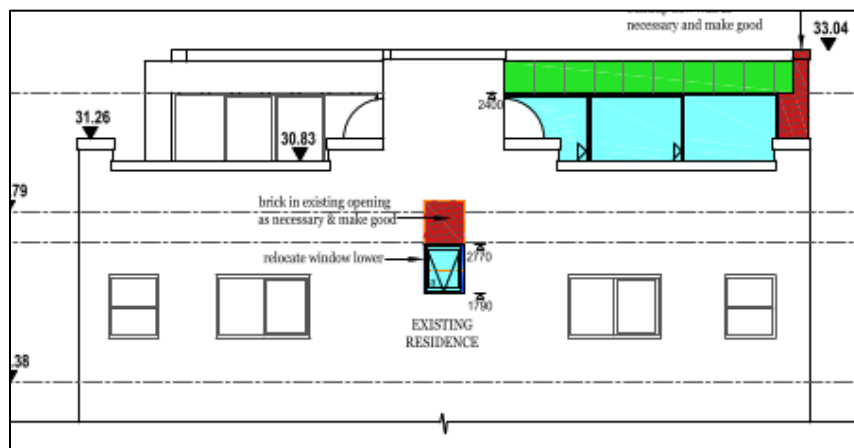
Southern elevation showing proposed addition will match the scale of the existing contemporary addition to this level. (Source: DBCF Pty Ltd, 2024)
